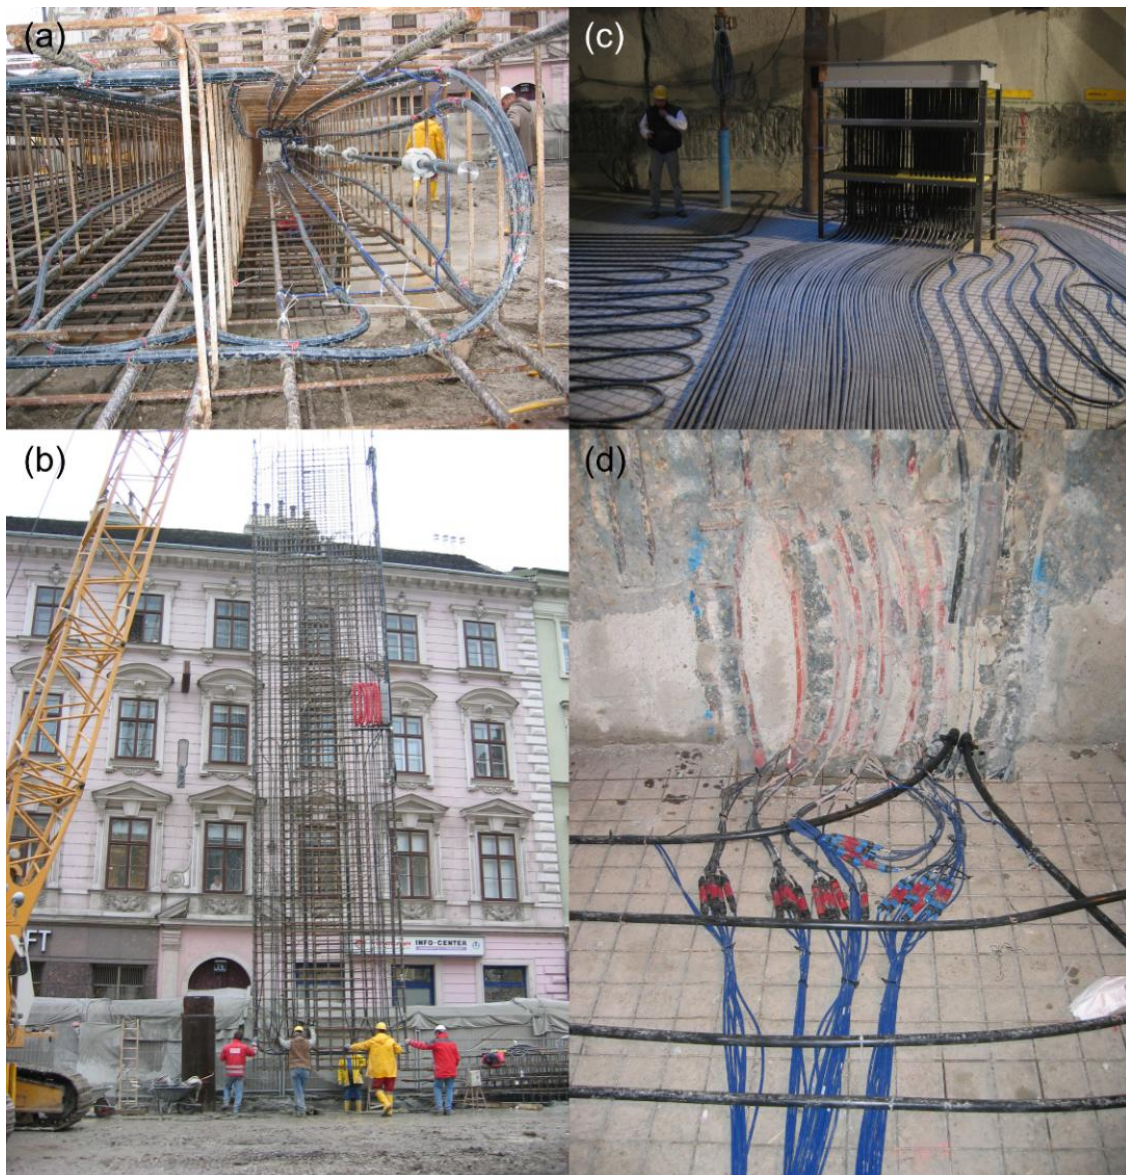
Installation and instrumentation at Taborstraße station: (a) Lower reinforcement cage of diaphragm wall No. 18 with offset sensors to clear the tremie pipe; (b) Lifting of the cage, showing protective covers for pipe and cable connections; (c) Heat exchanger pipes and feed-throughs beneath the 2 m thick bottom slab; (d) Inlet/outlet configuration, including attached temperature sensors and sensor cables.
